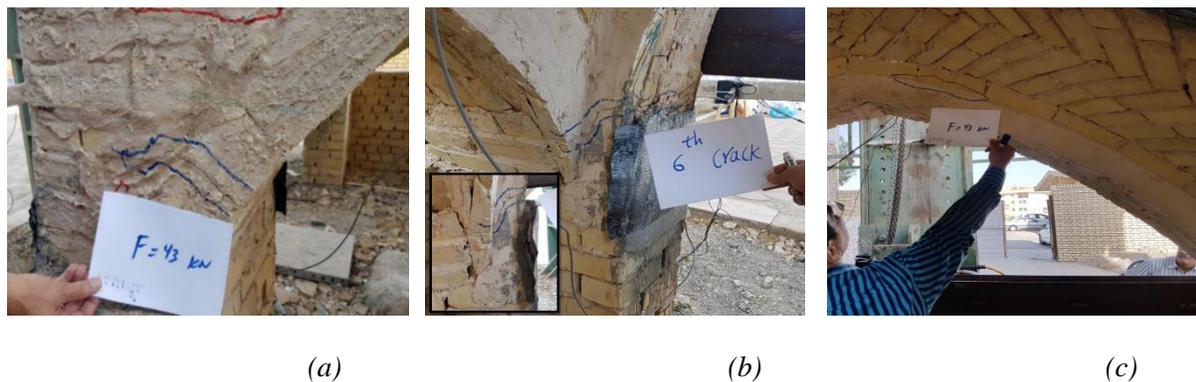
fracture changes in rib cover and vault structures under vertical and horizontal loading in reinforced structures: a) Cracks in the spring openings under load 43 KN; b) Detachment of FRP cement mortar under loading 29 KN; b) Cracks in the span of vault under load 43 KN.
